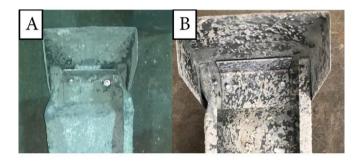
A) Failure mode of centrically loaded specimen, B) Failure mode of eccentrically loaded specimen
